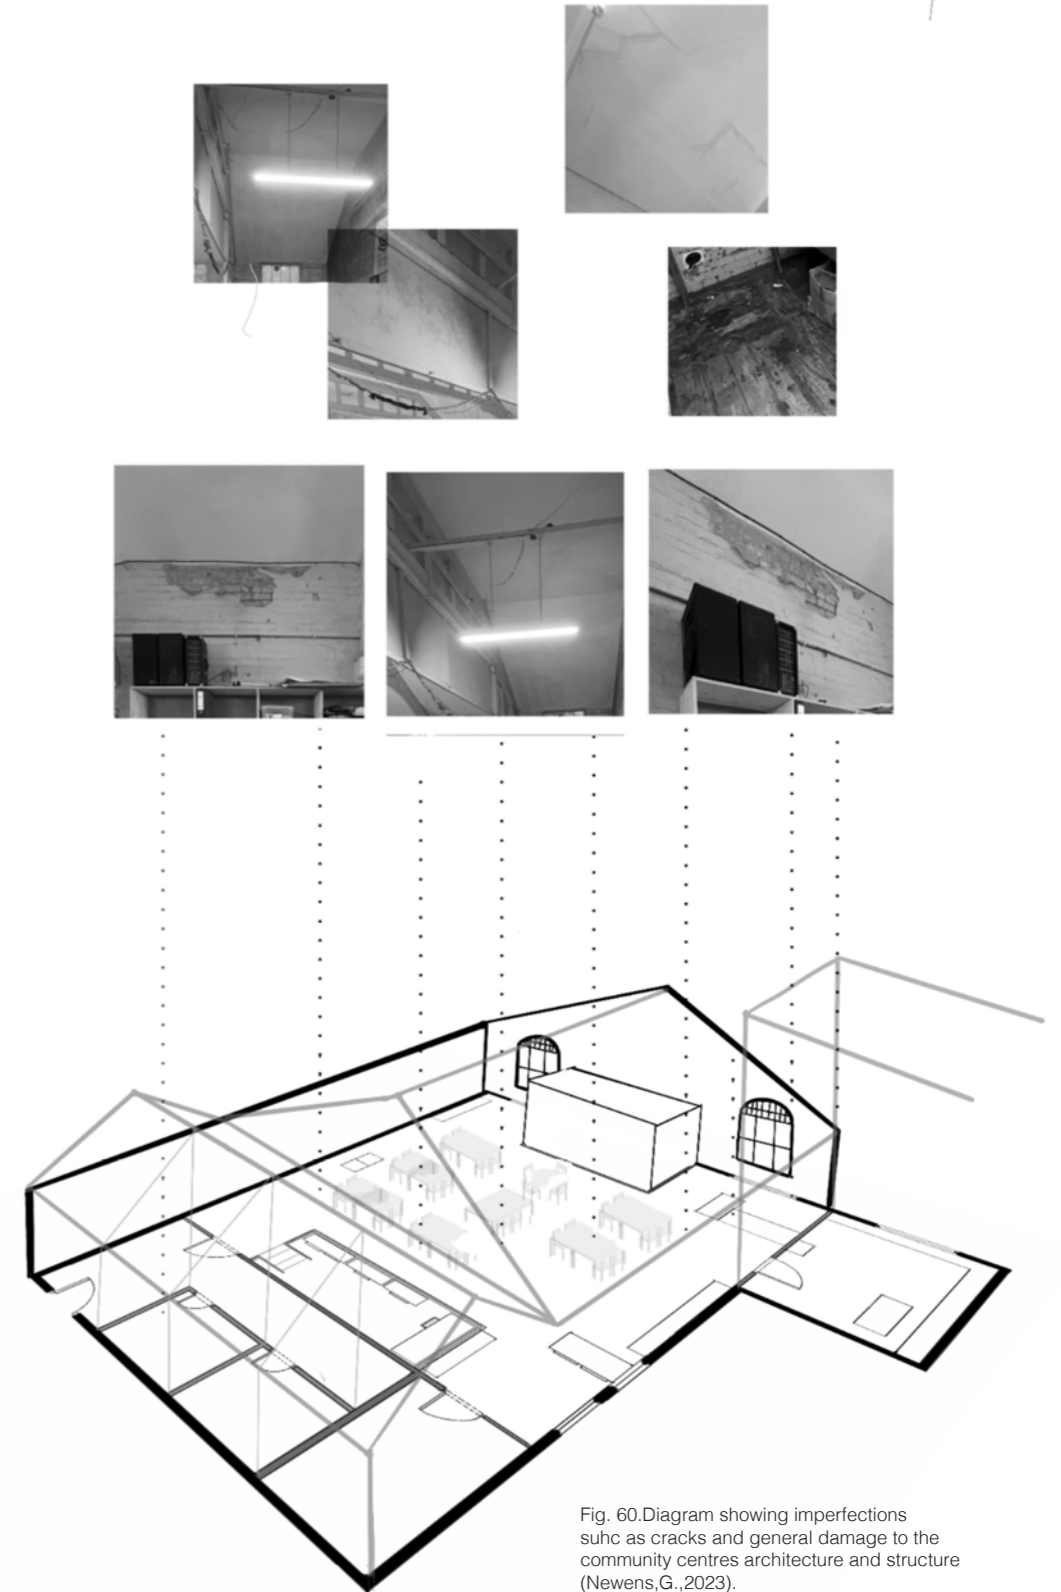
Diagram showing imperfections such as cracks and general damage to the community centres architecture and structure (Newens,G.,2023).
